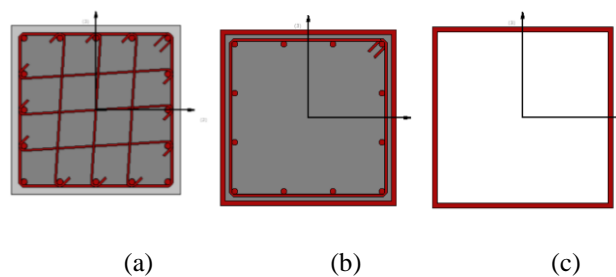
a) Reinforced concrete, b) Composite, and c) Steel column section model view from SeismoStruct (SeismoSoft 2018).
